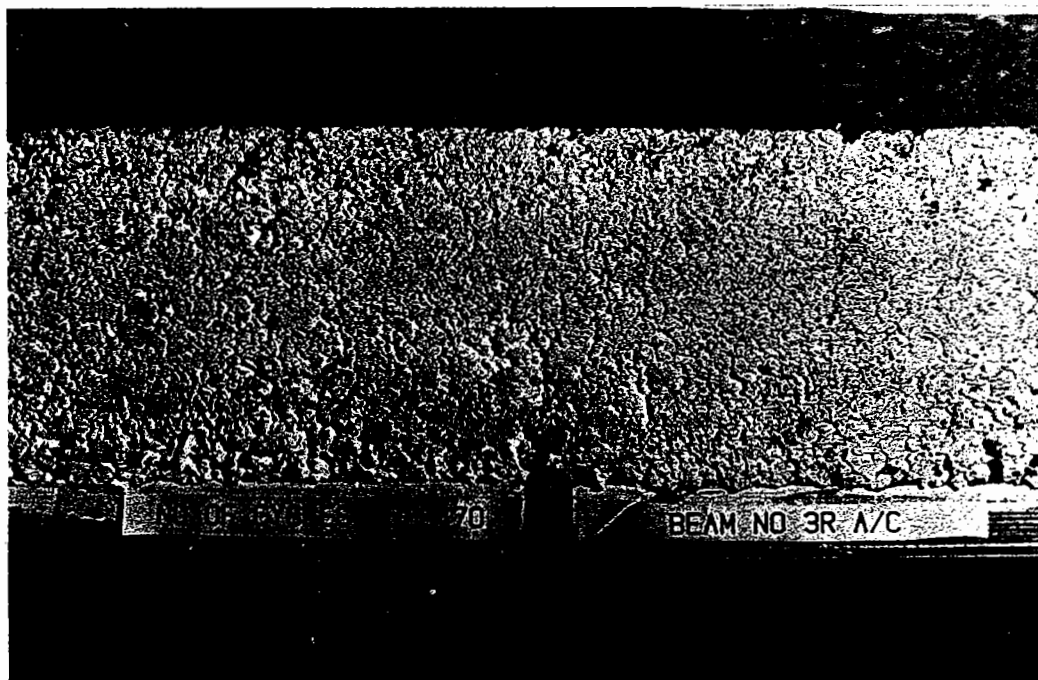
Crack Lengths for Unreinforced Beams and Beams Reinforced at Base of Asphalt Layer (A.C.)
